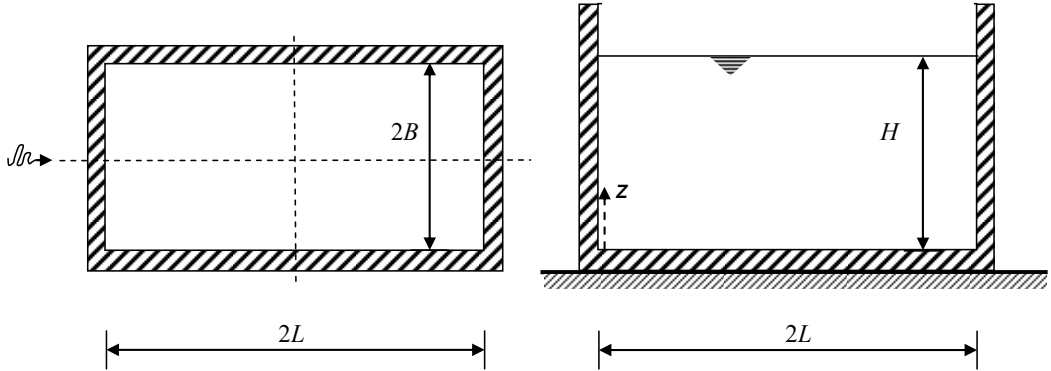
Geometry of rectangular tanks a) plan, b) sectional elevation
